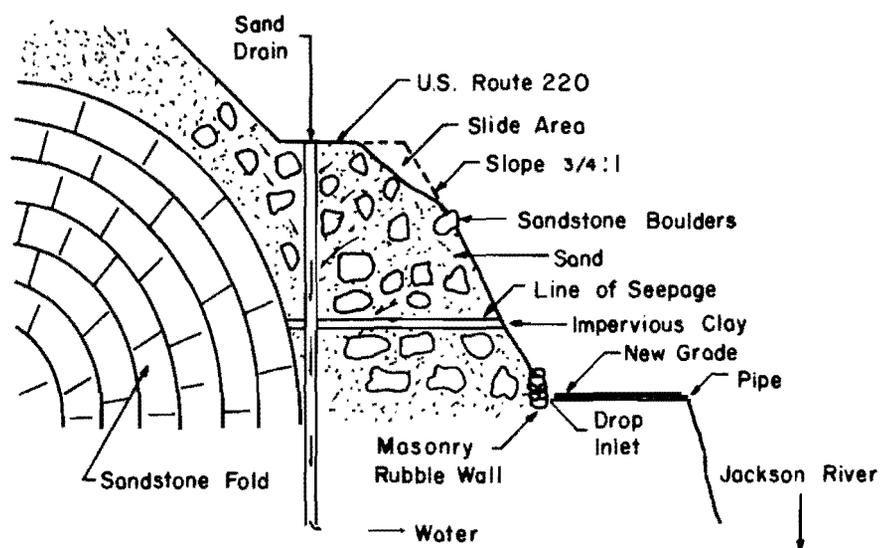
Remedial drainage - U.S. 220, Alleghany County, Virginia (Parrott, 1955).
